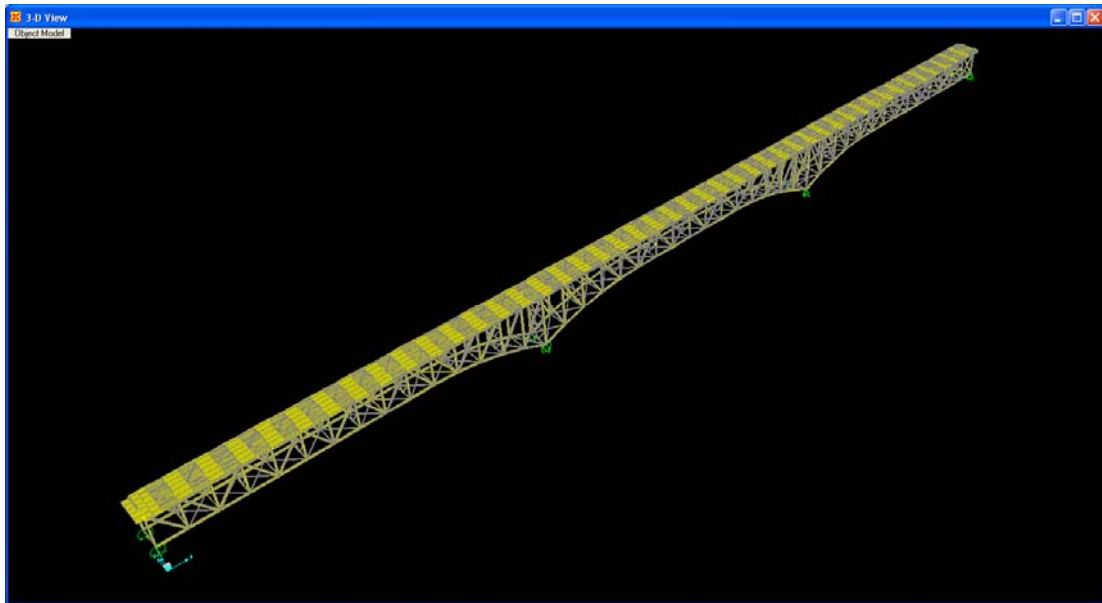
SAP2000 Model of Deck Cantilever Truss Bridge
